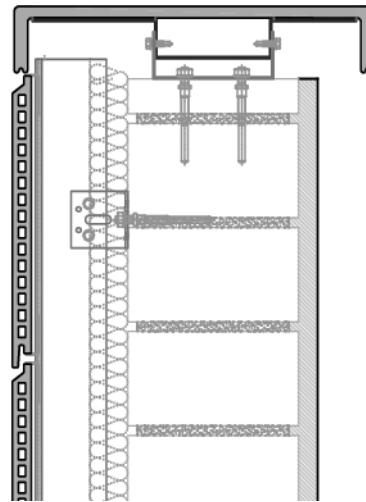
Horizontal section. Faveton® SAH Acqua 20-H.
